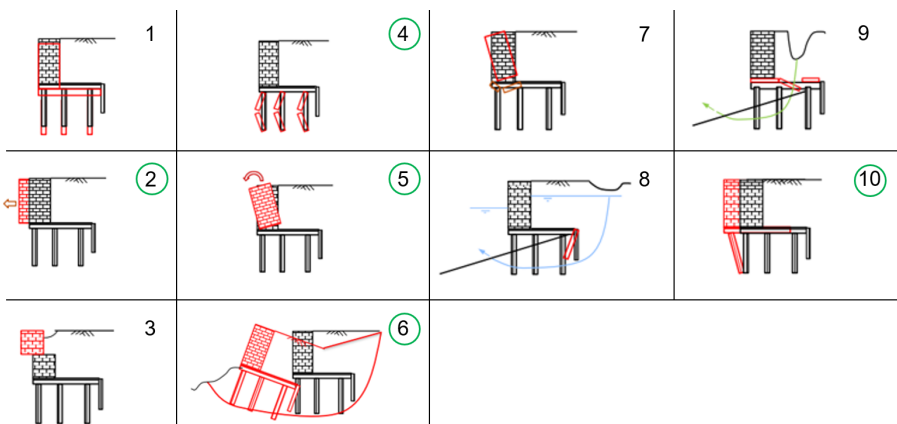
Cross-sections of typical failure mechanisms in Amsterdam. (Gemeente Amsterdam, 2021c)
